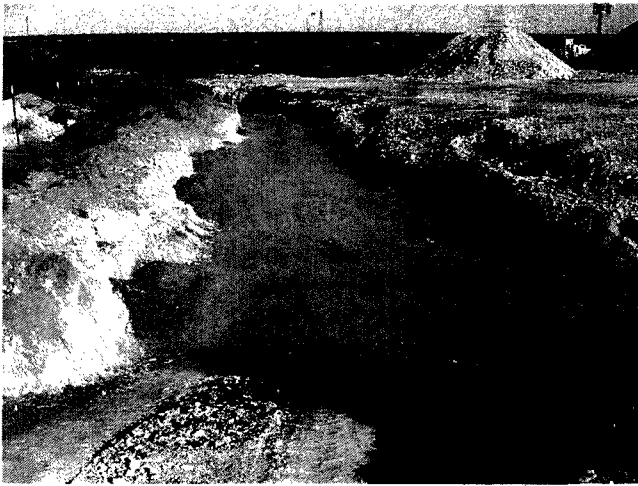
Installation of clay liner in eastern portion of excavation, looking westerly.
